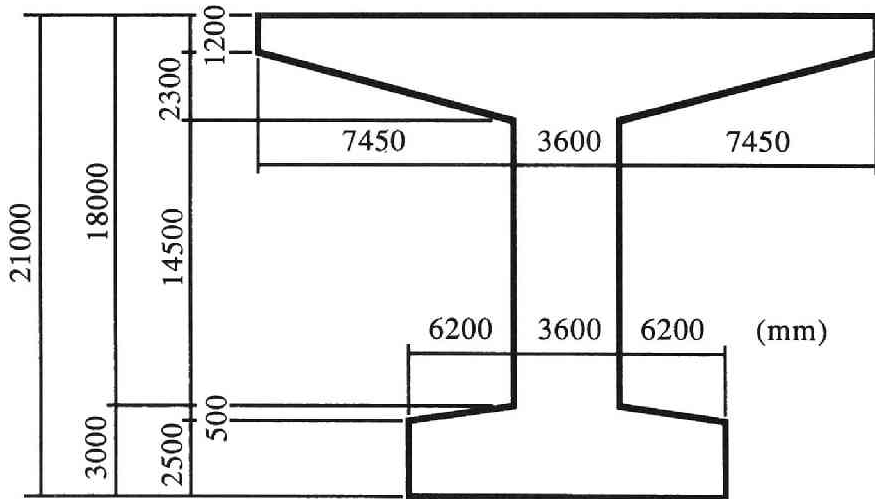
T-shape bridge pier model used for retrofit case study.
